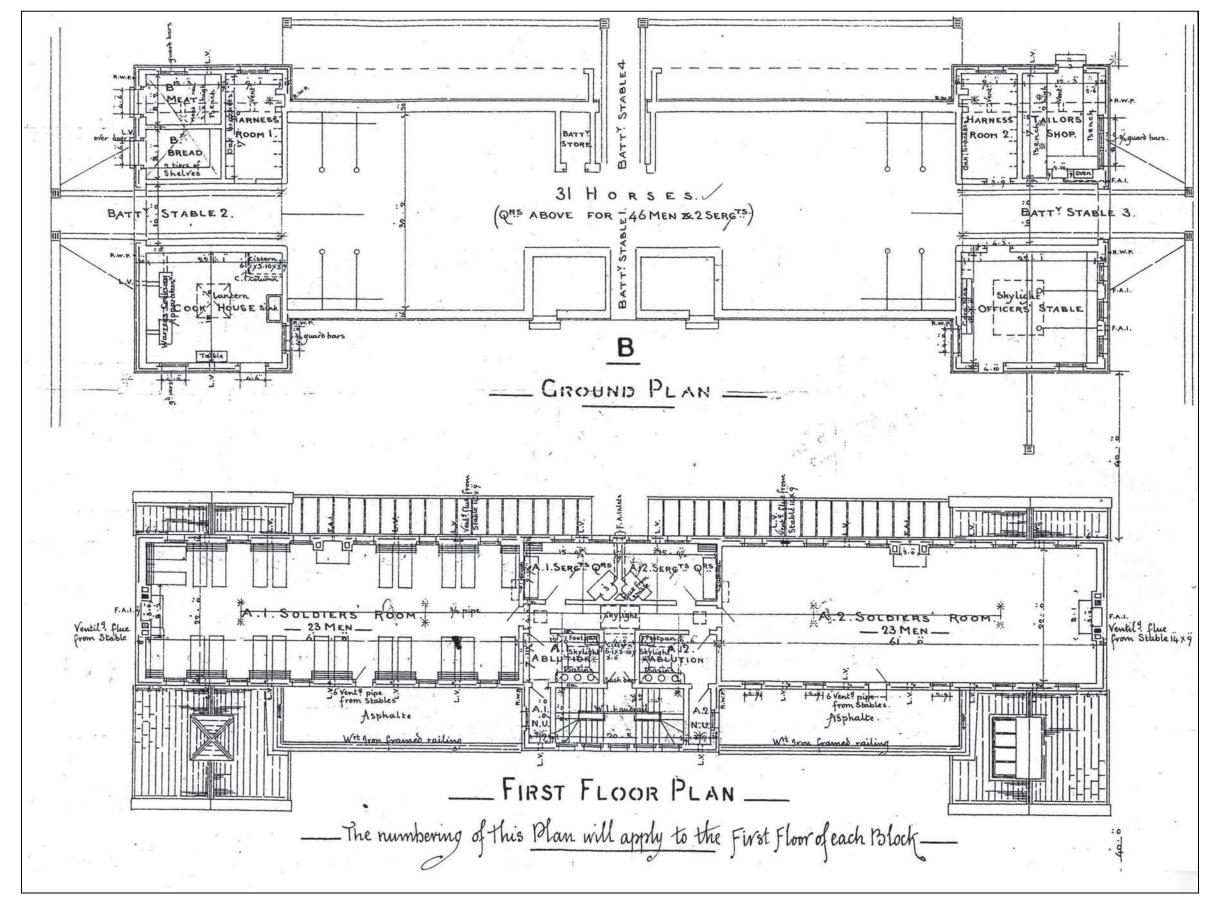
Historic floor plans of stable block B (NMR MD95/1445 no.5)
